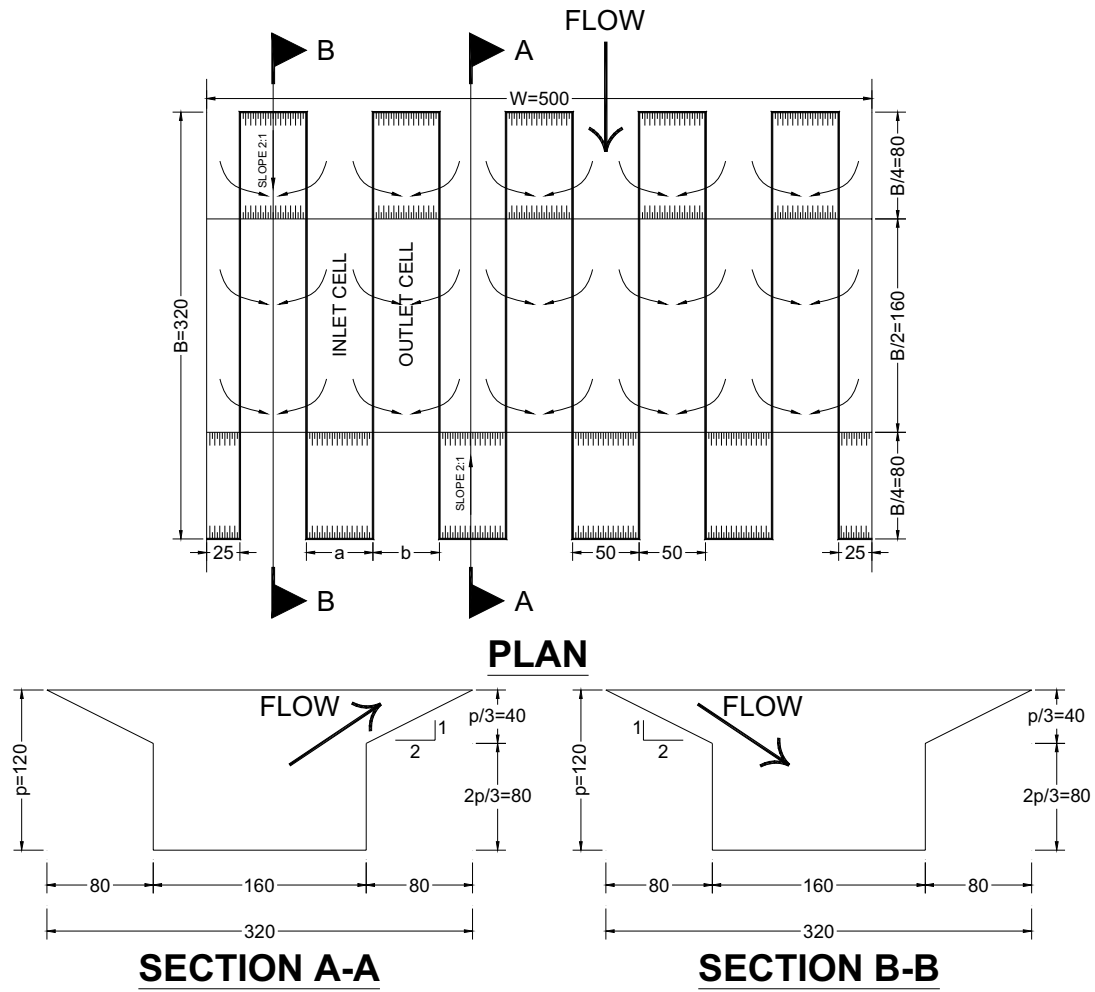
Plan and section of model P_1M_1 (dimensions in mm)
